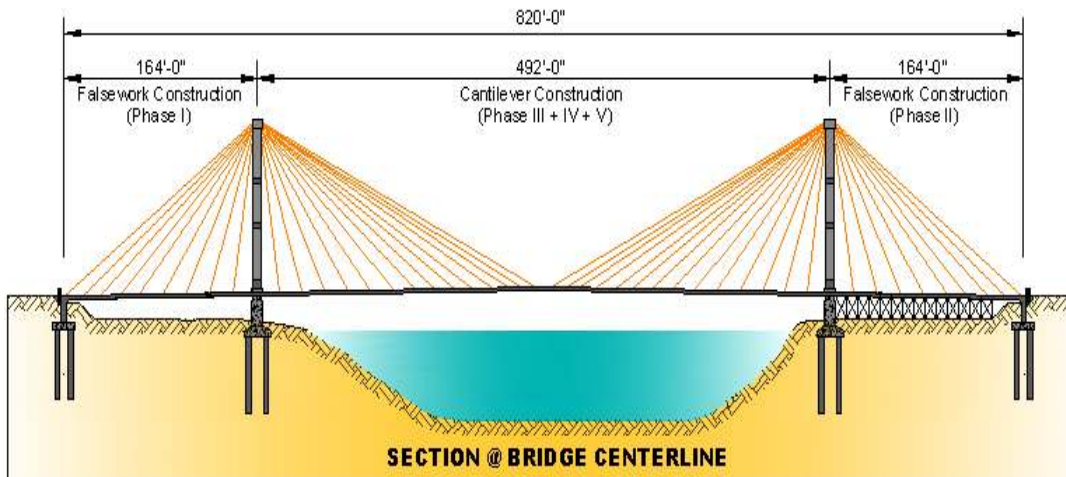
Yelcho bridge sidespans on falsework counterbalance mainspan cantilevers
